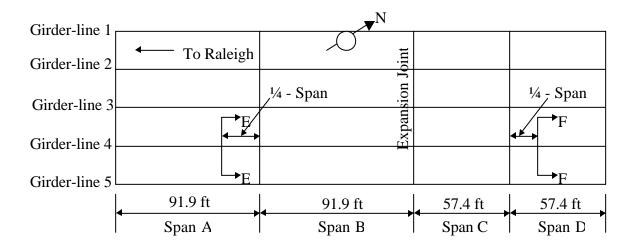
Installed Thermalcouples In Cross-Sectional Locations Along The Deck
